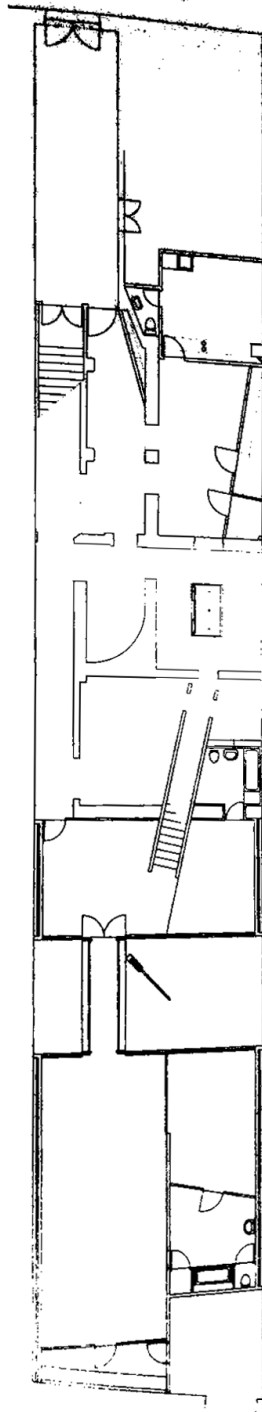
Ground floor plan of the Cotenko Apartment. Courtesy the Estate of the Artist and Betts Project.
